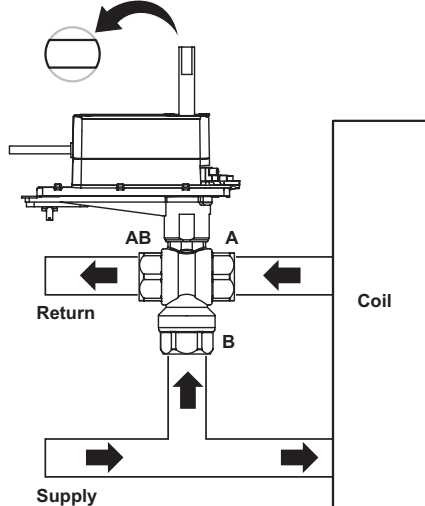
illustrates how 2-Way, 3-Way Mixing and 3-Way Diverting ball valve assemblies are to be piped.
